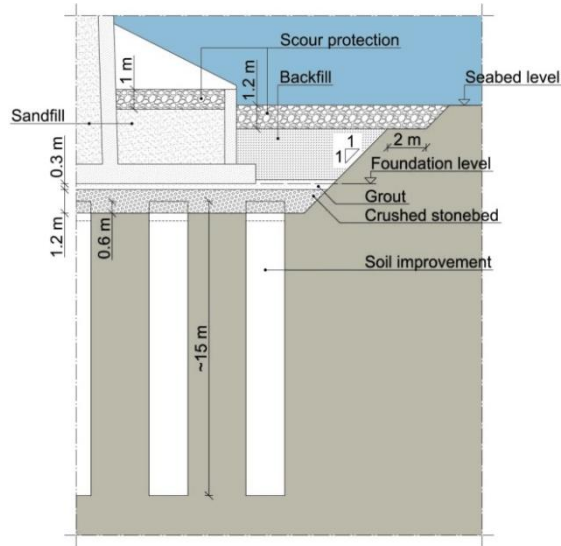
Layout of pier foundations for piers F1 to F28
